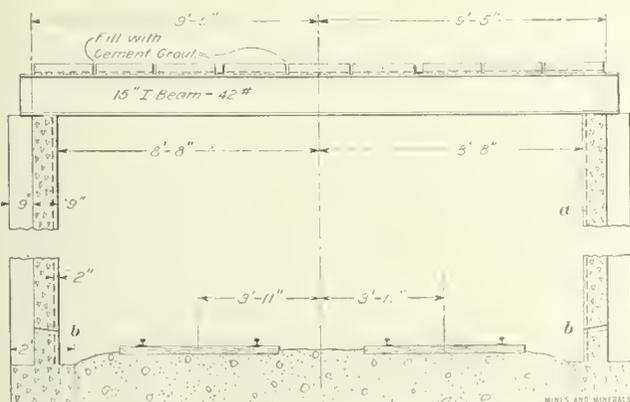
SECTION OF HEADING, SHOWING CONCRETE SLAB WORK
